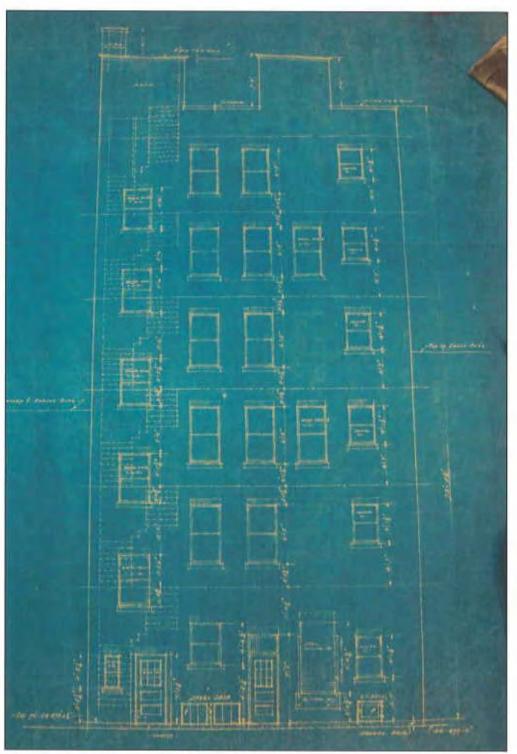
1924 Duprey Building west elevation. Reproduced by permission from the Massachusetts State Archives.
